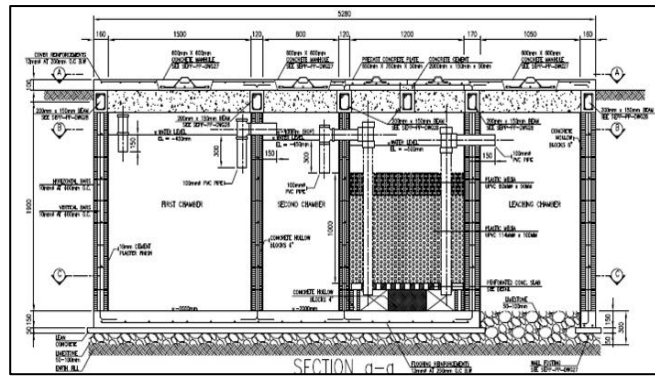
Method 1 (Site 1 & Site 3) ST + SMT facility Section
